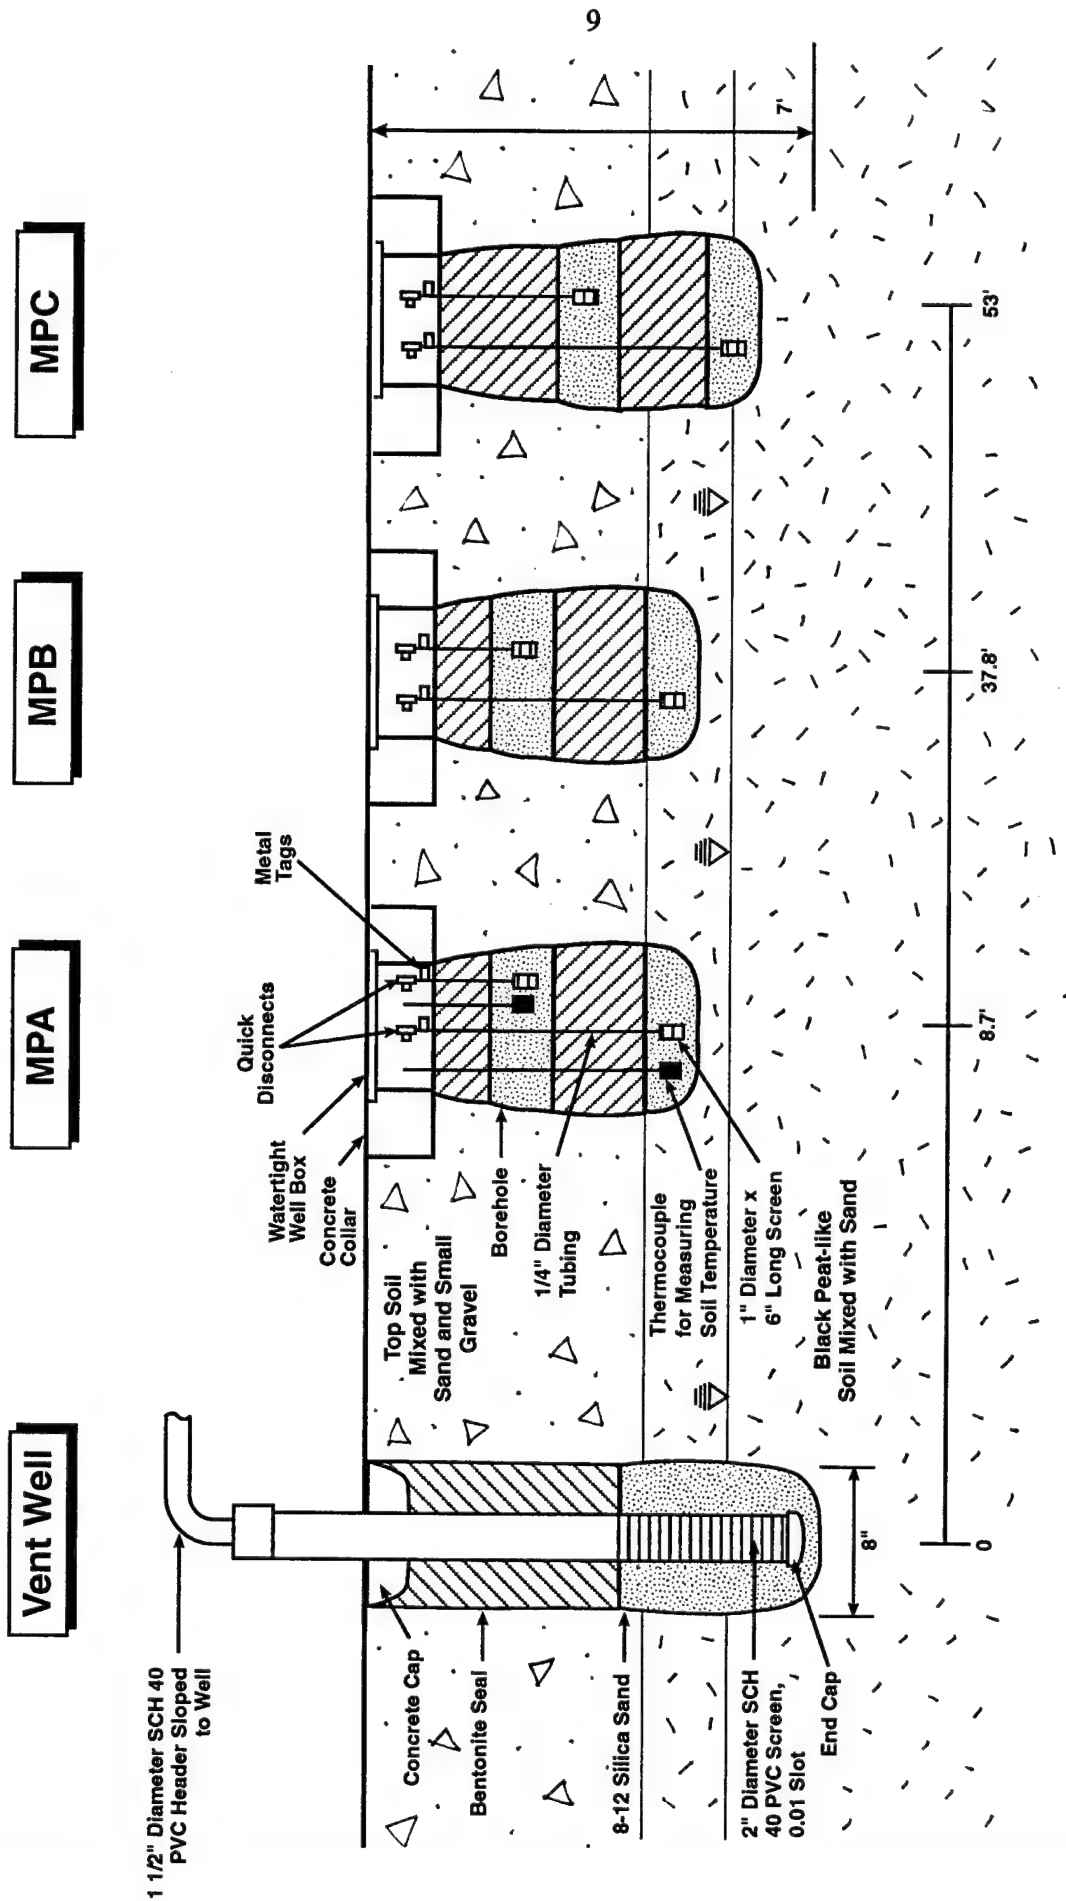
Cross Section of Vent Well and Monitoring Points at Building 1639 Showing Site Lithology and Construction Detail (not to scale)
